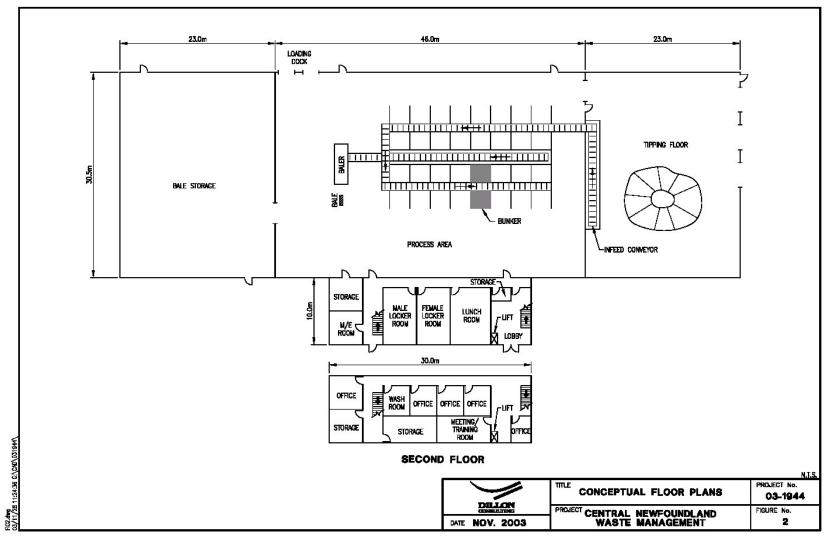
Concept Floor Plan for Material Recovery Facility.
